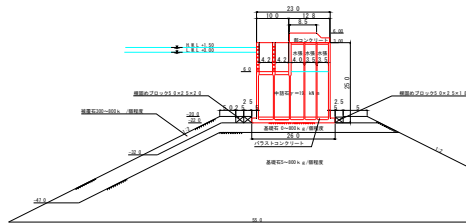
Standard cross section in the deep water section of the South Breakwater
